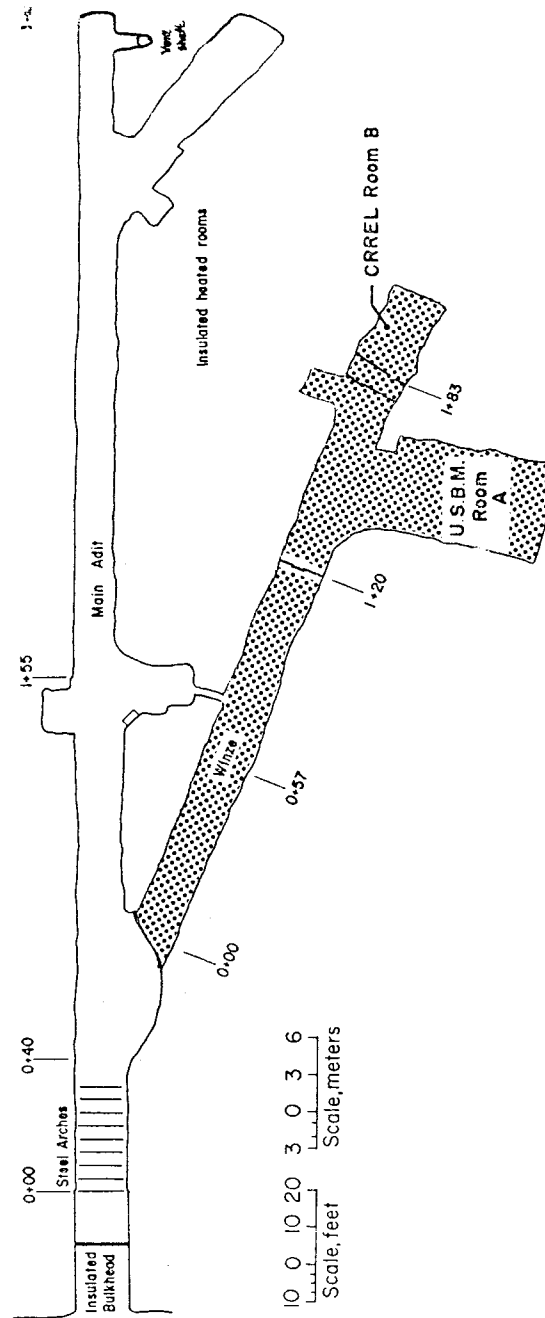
PLAN OF FOX TUNNEL SHOWING SECOND STAGE OF EXCAVATION (Pettibone, 1973)
